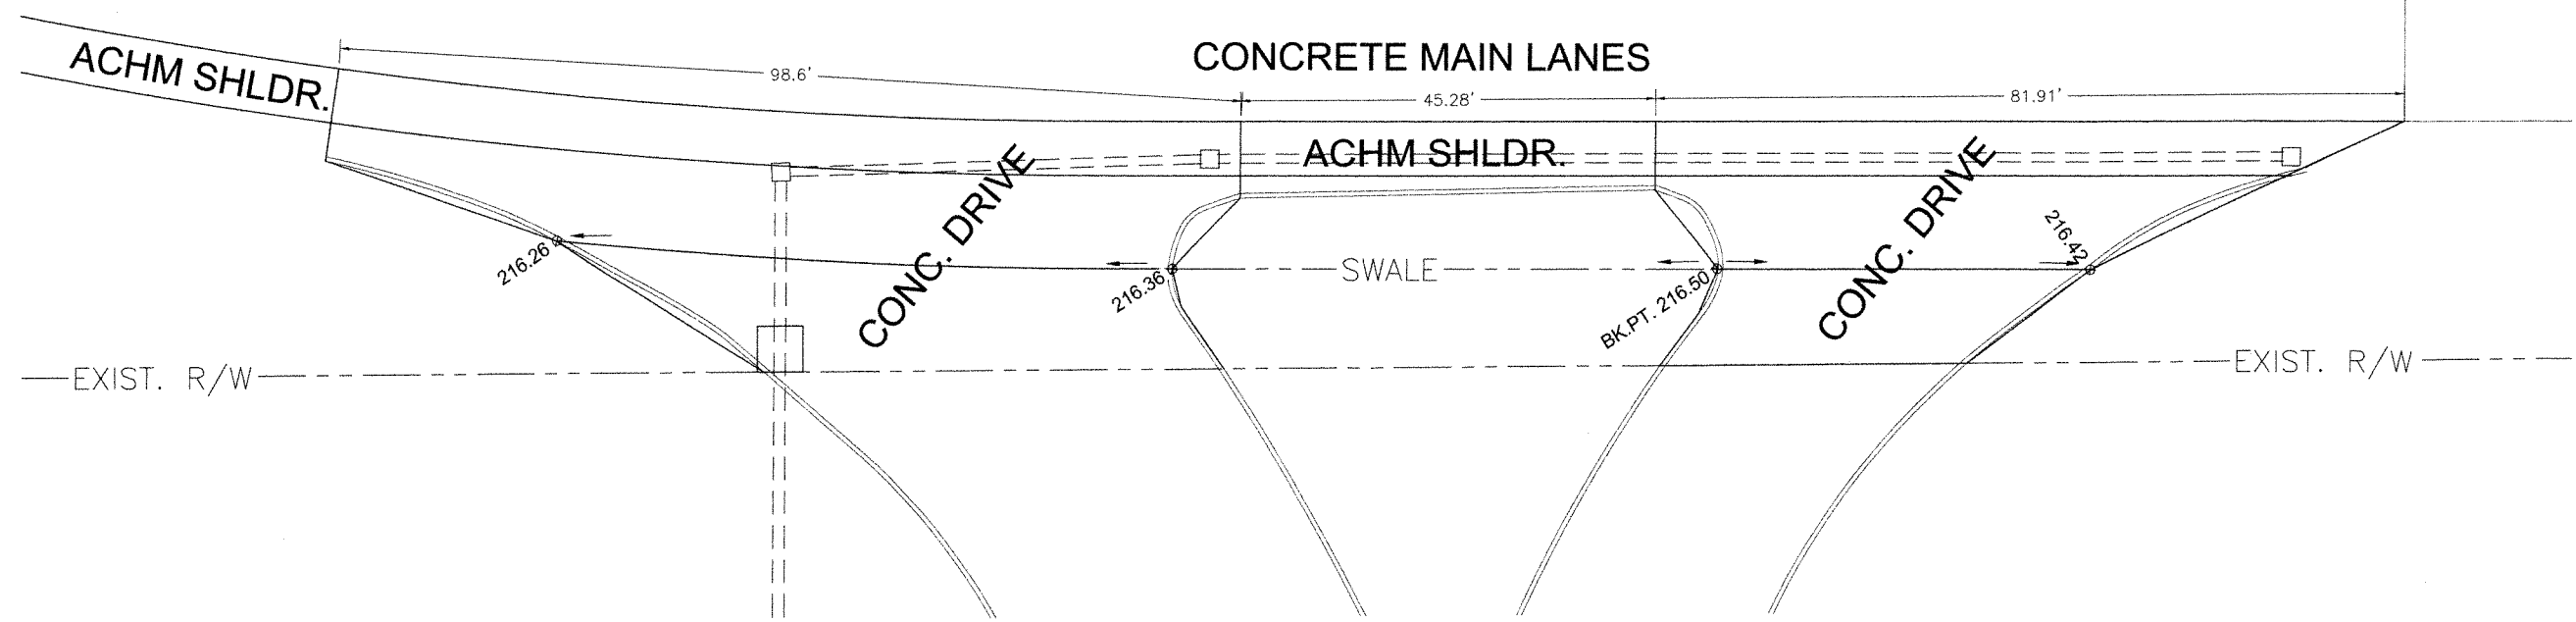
DETAILS OF ROADWAY WIDENING FOR GUARDRAIL
